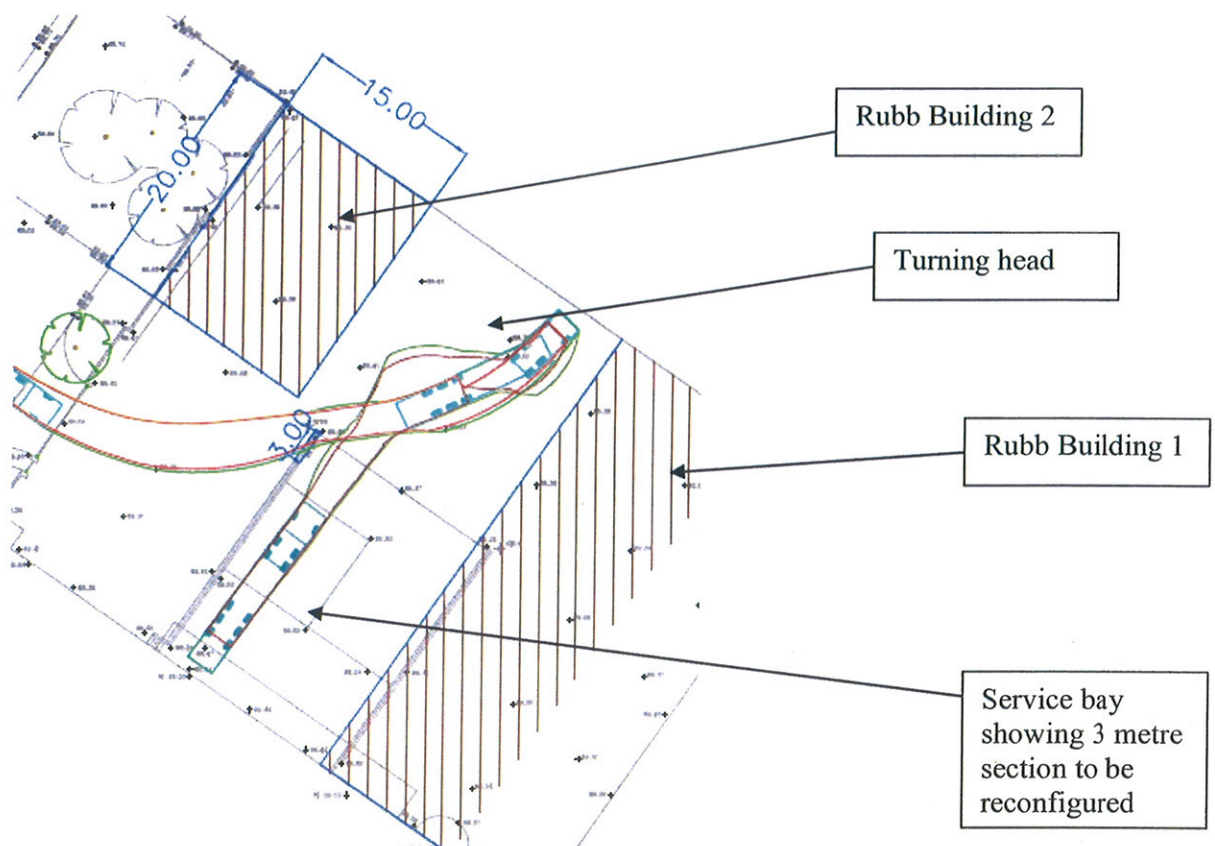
Proposed layout of the service yard and proposed siting of the two RUBB structures.
